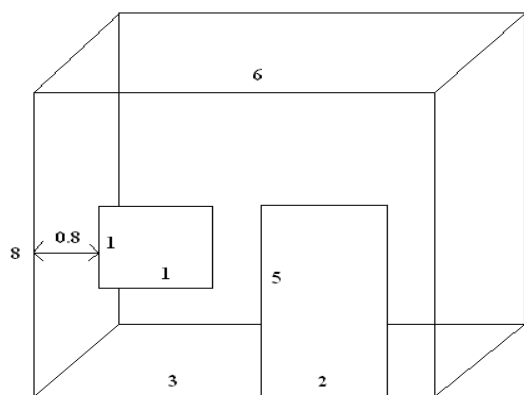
b. An expanded view of the 1st floor of building 1 with the position of door and window (All dimensions in meters)
